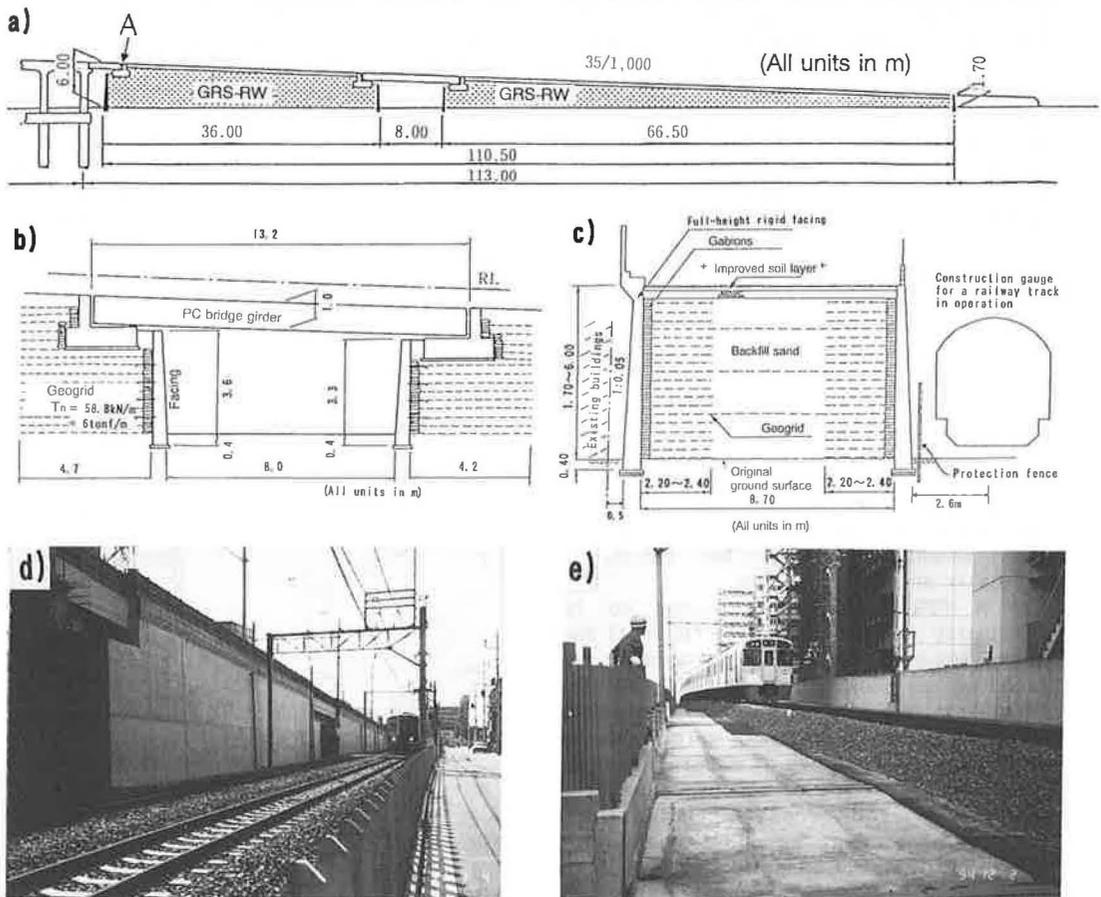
Approach fill constructed by the GRS-RW system for the Seibu Line in Tokyo; a) general view, b) bridge abutment, c) cross-section, d) general view, and e) view at the crest
